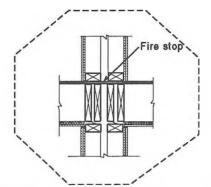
Section through the specimen showing the fire stop under the party wall separating rooms A and B.
